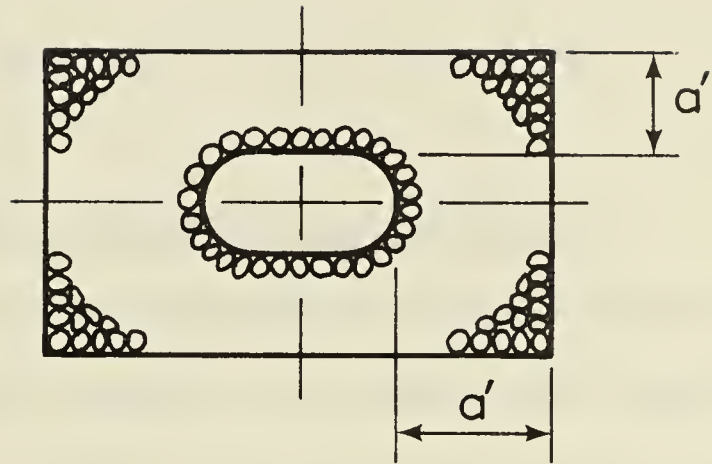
(b) FLAT PIER RIPRAP IN PLAN
